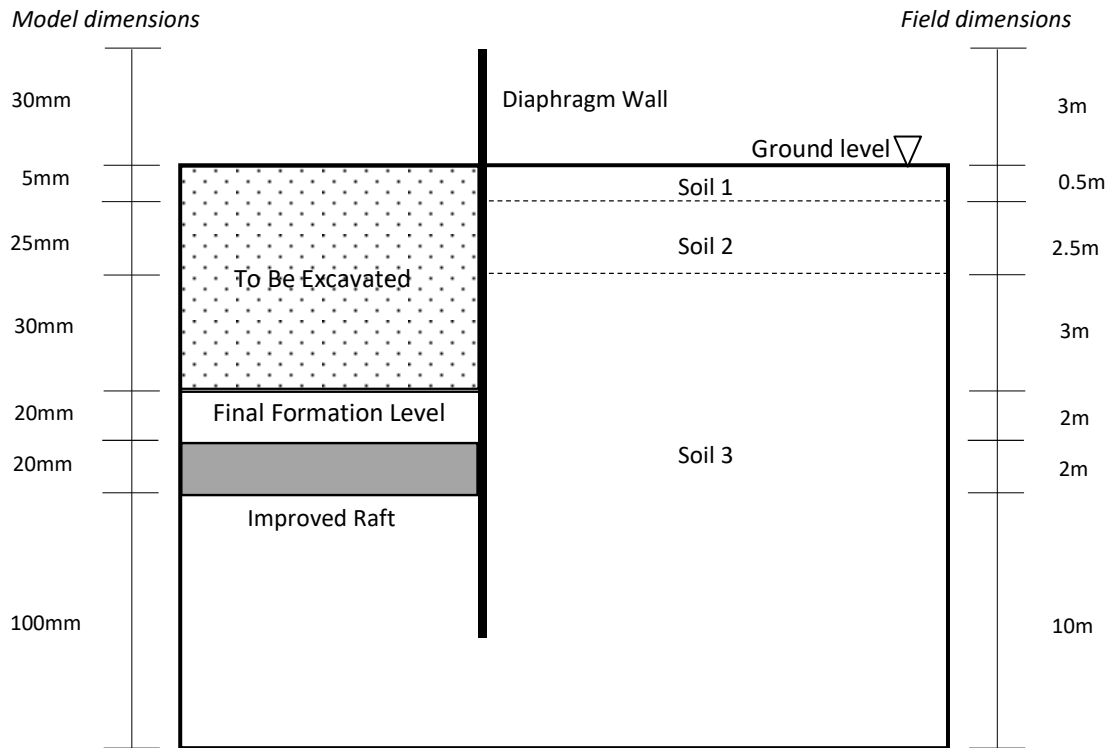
Schematic of excavation provided with embedded improved soil strut, as used in Kongsomboon (2002)
